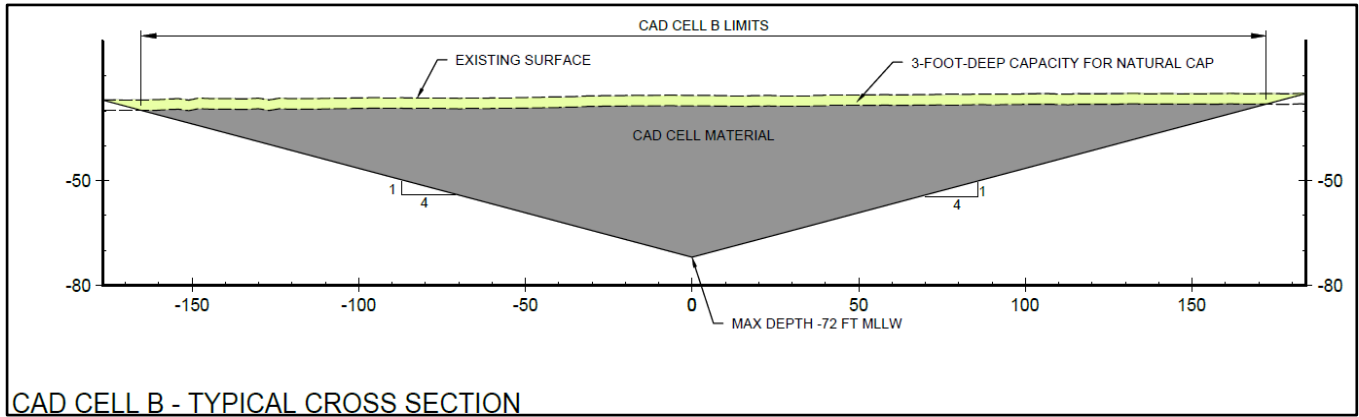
Searsport Harbor Primary CAD Cell B Dimensions
